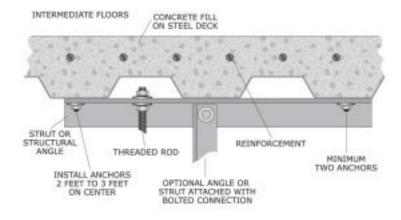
Cast-in-place anchor; concrete fill on steel deck.
